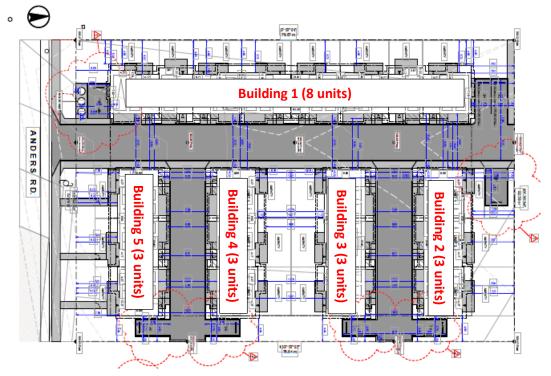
Site plan (red clouds indicate visitor and accessible parking)
